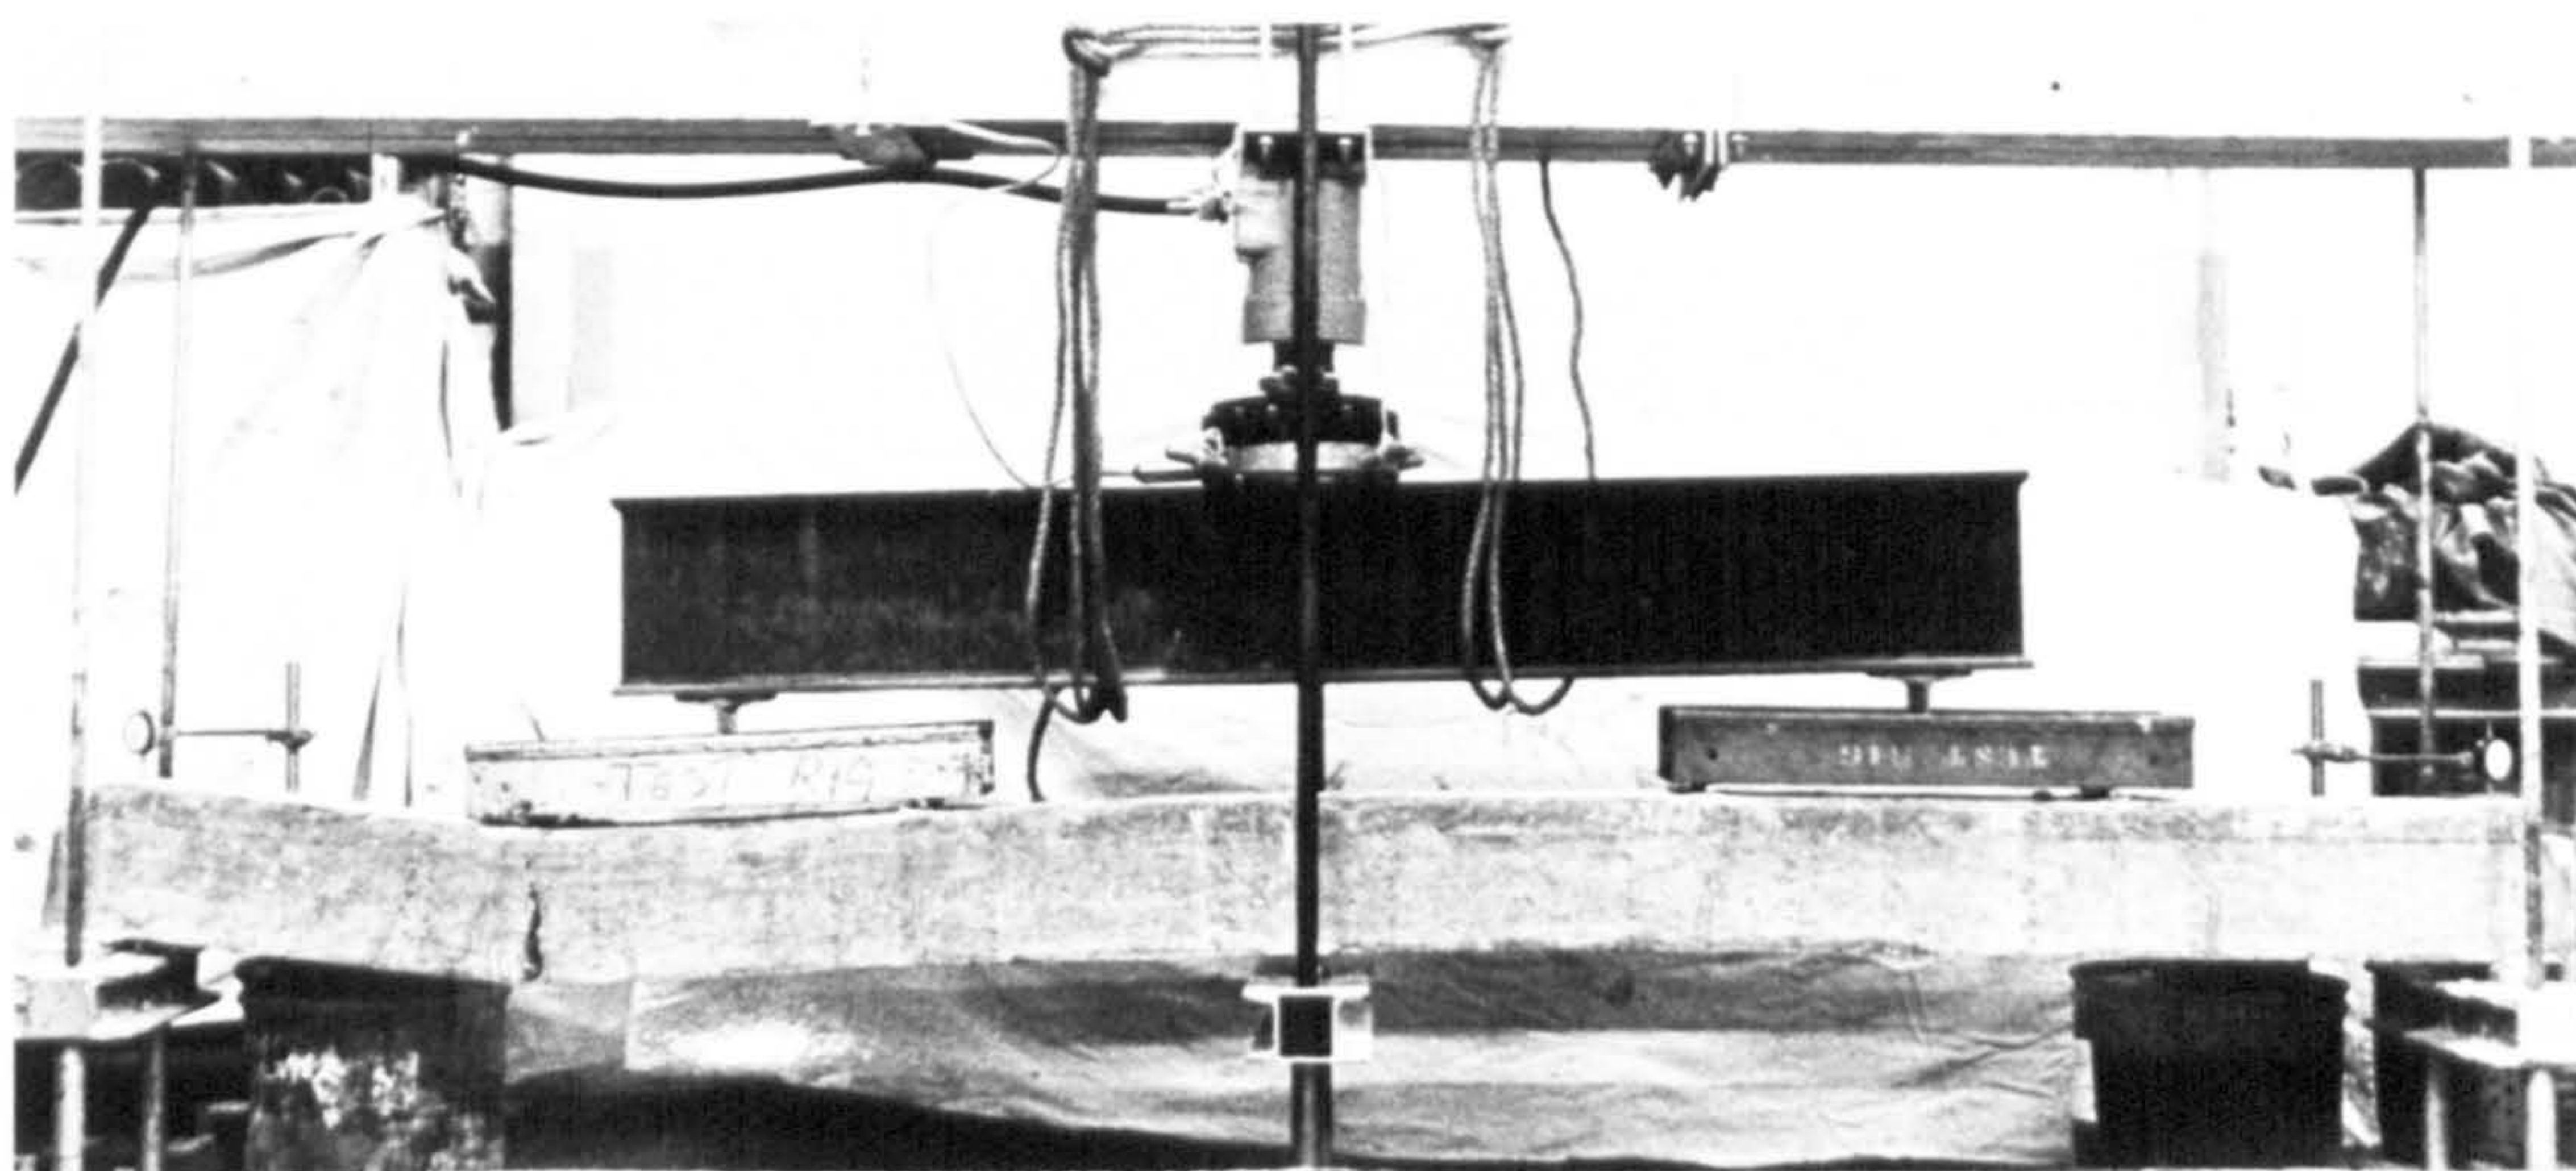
Reinforced concrete continuous beam on testing rig after failure
